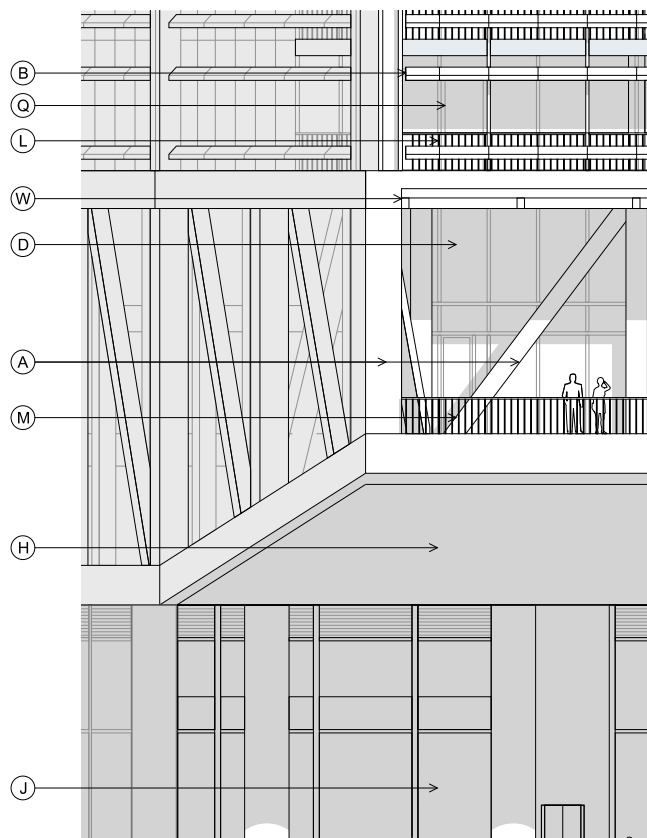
Elevation — Facade Study Northwest Corner
